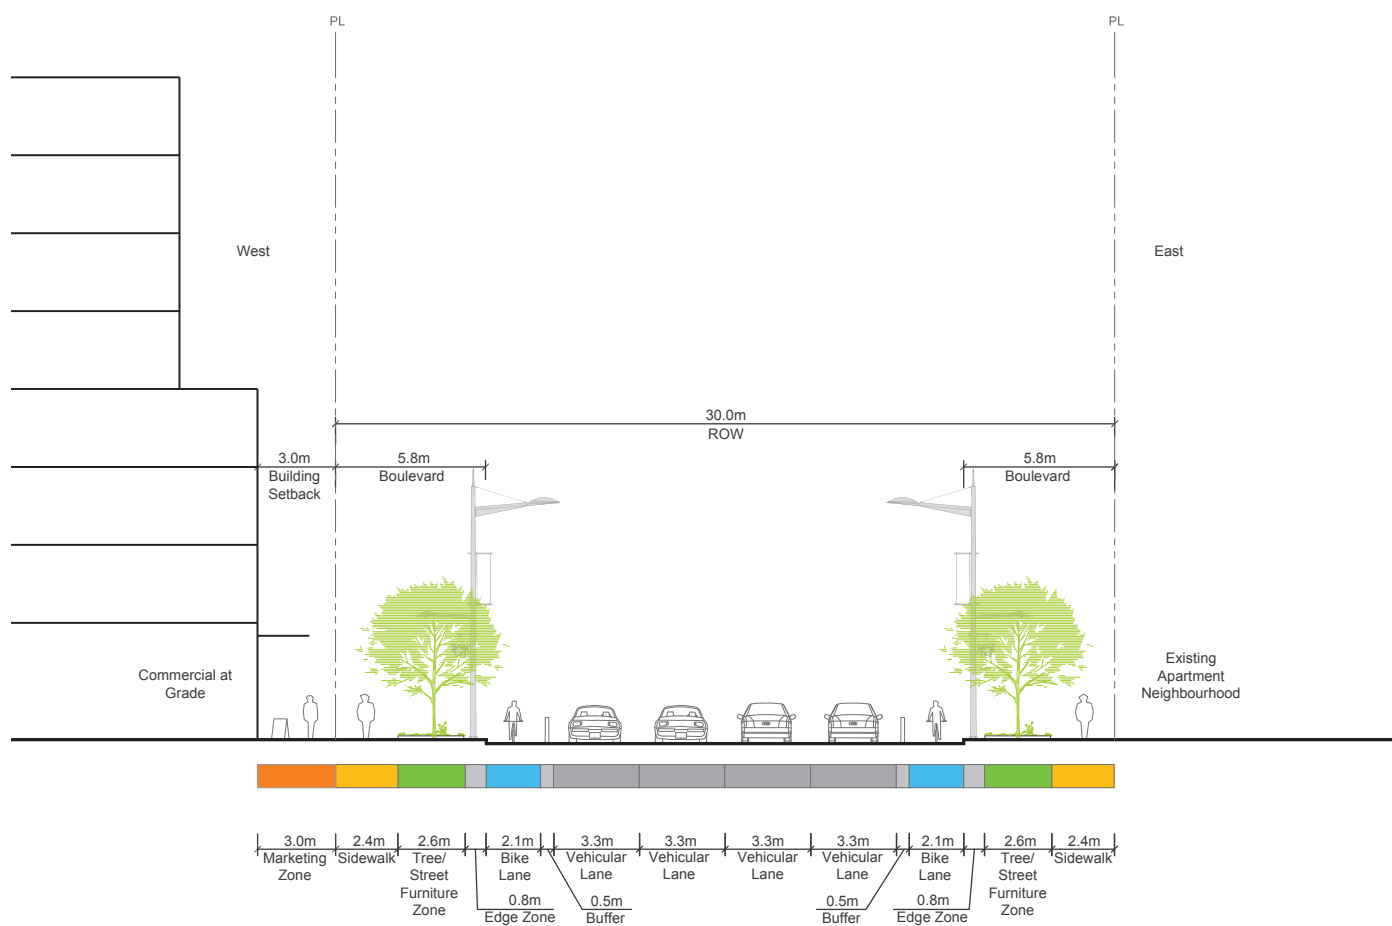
Conceptual Cross-section of Birchmount Road with Improved Streetscape (30m ROW)
